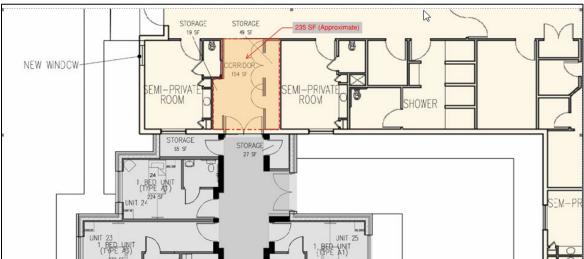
Section of floor plan showing renovation space to form connector corridor to new CCF unit.
